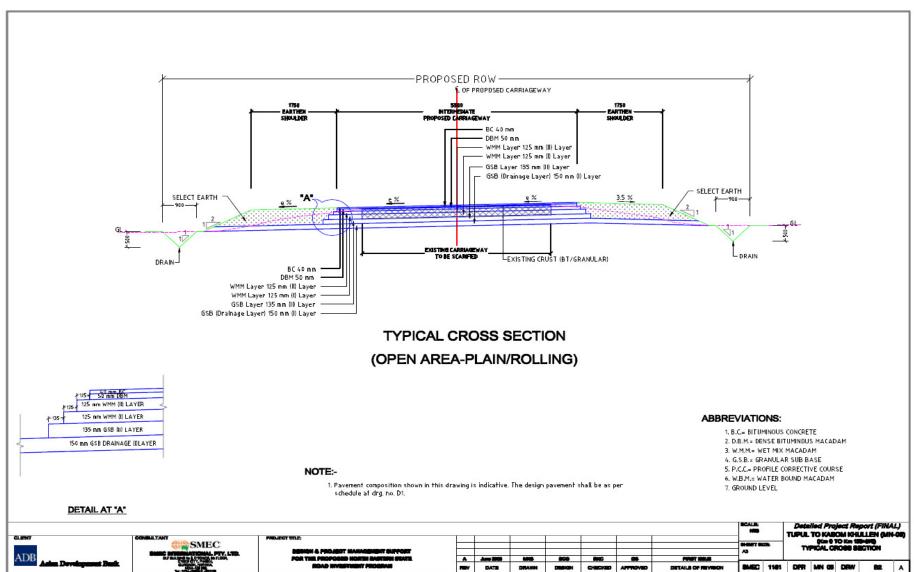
Proposed cross section in Open Area – Plain /Rolling
